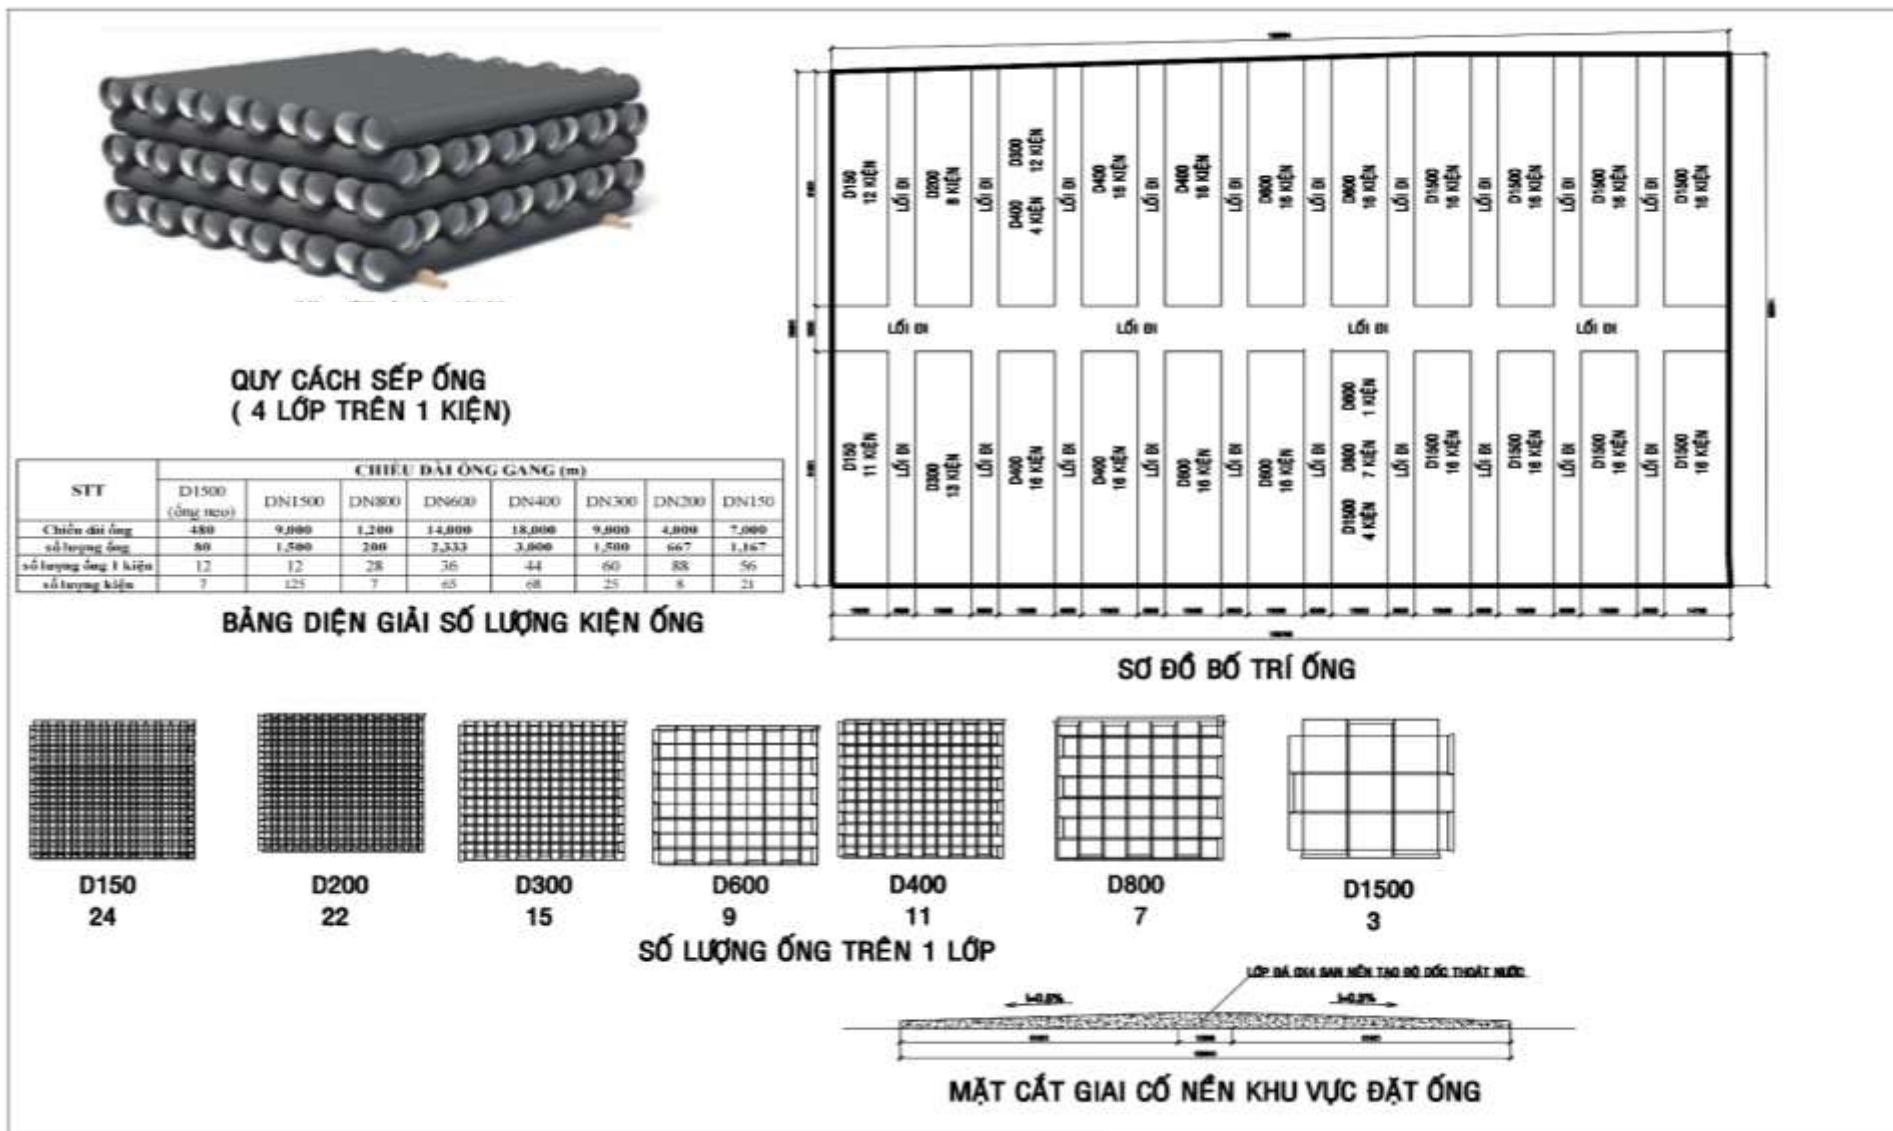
The method for storing and arrangement of the pipe bales in the storage
